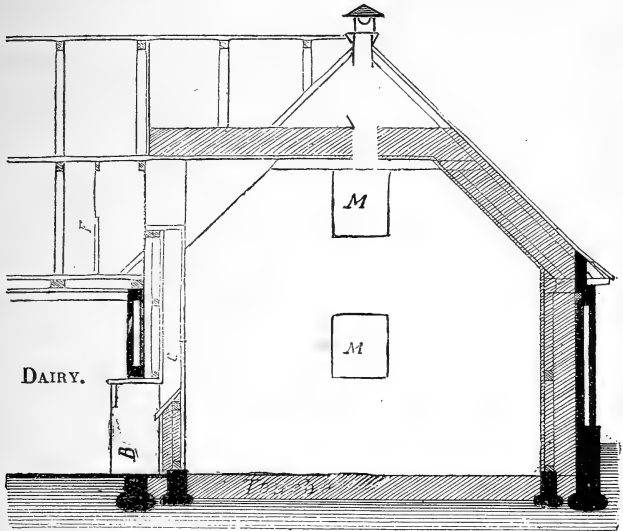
Ice house and dairy.—*MM*, Openings for filling the house
